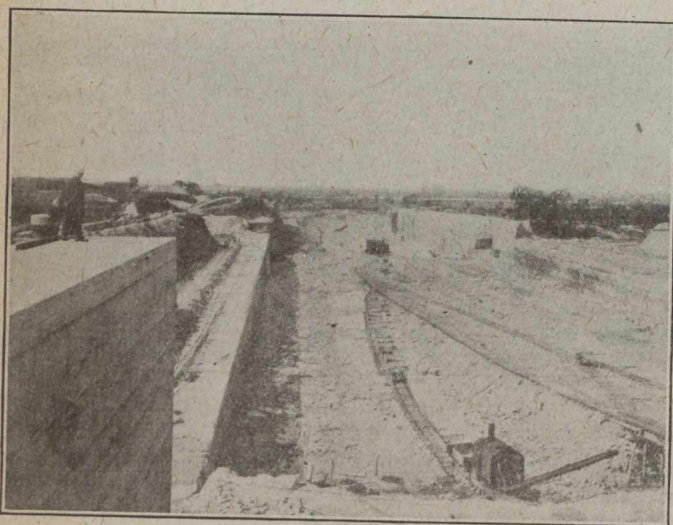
Showing Rock Cutting on Site of Flight Locks, Section No. 3
